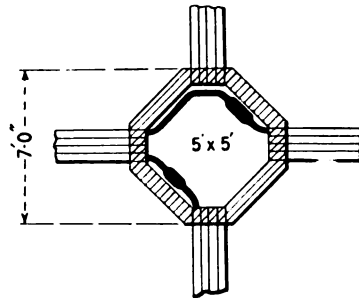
PROPOSED ARRANGEMENT OF MANHOLE
